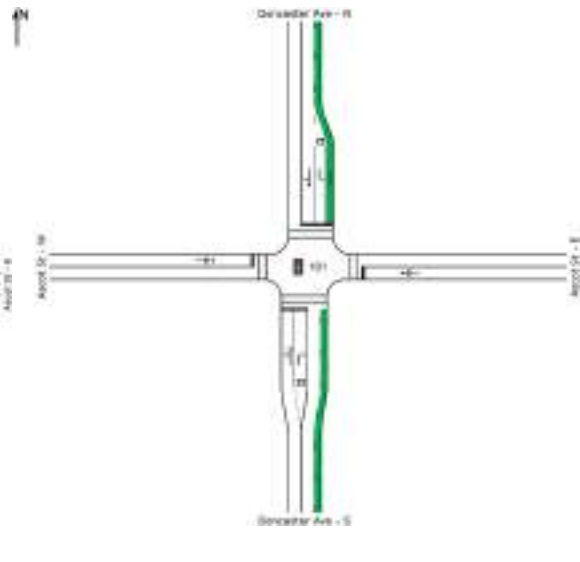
Proposed Doncaster Avenue/ Ascot Street layout
